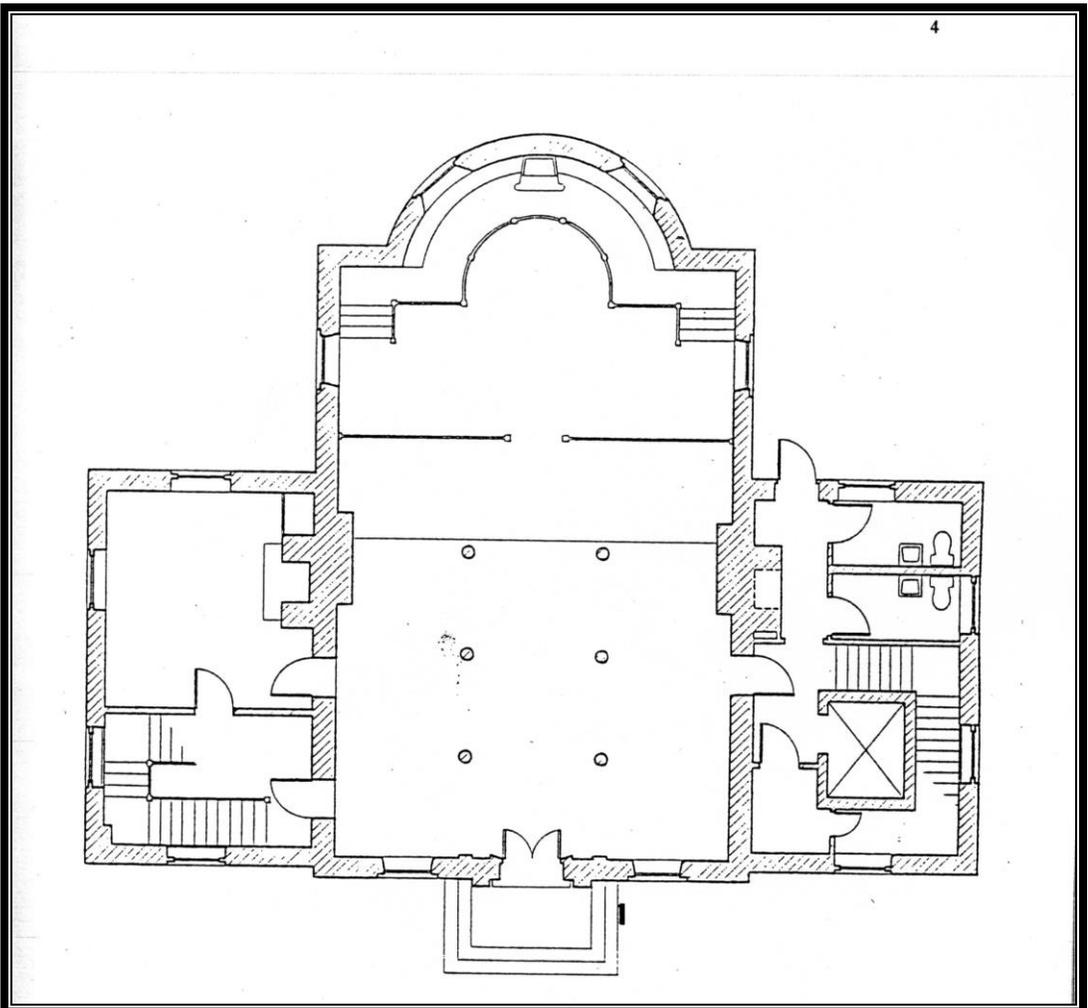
Floor Plan of the Chowan County Courthouse (from Clauser 1996)
